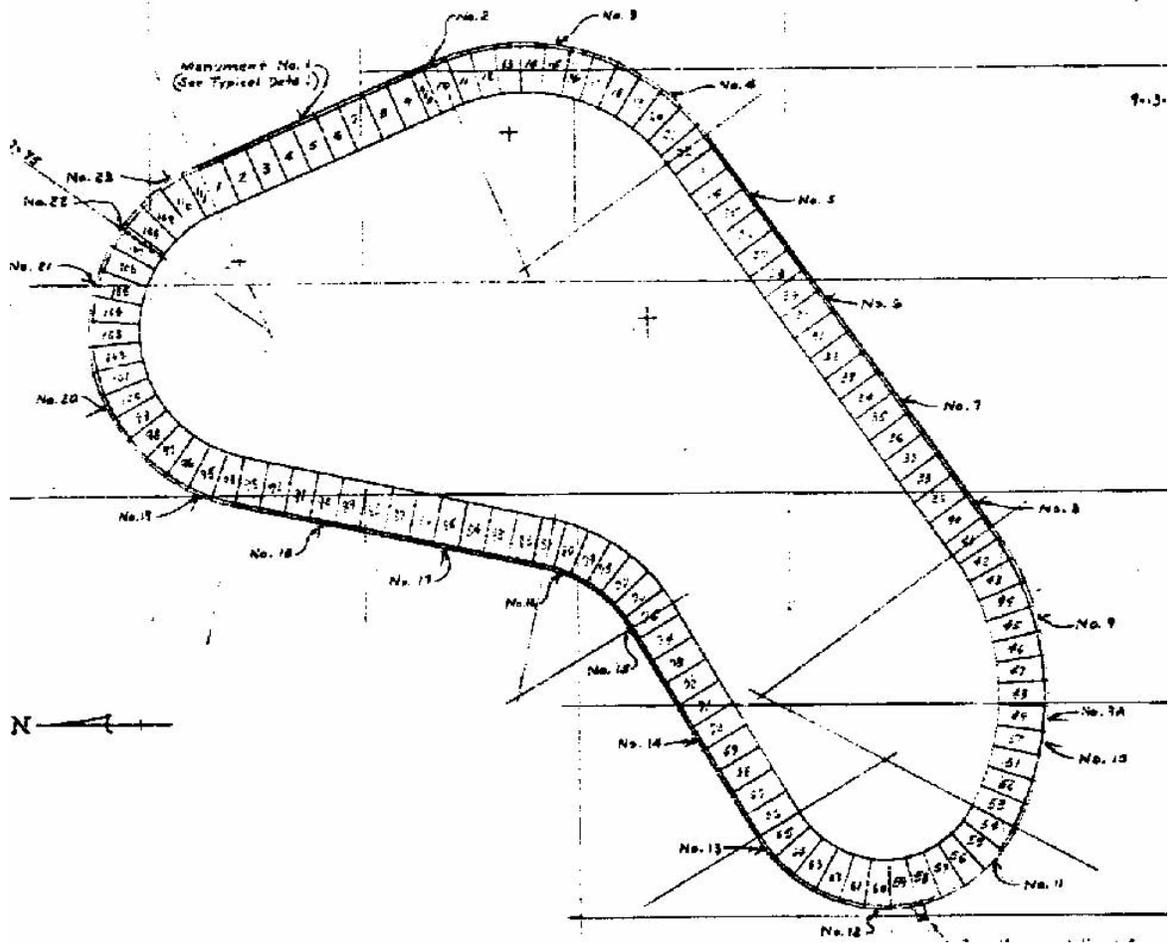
Location of Settlement Survey Pins in Parapet Wall Footer
